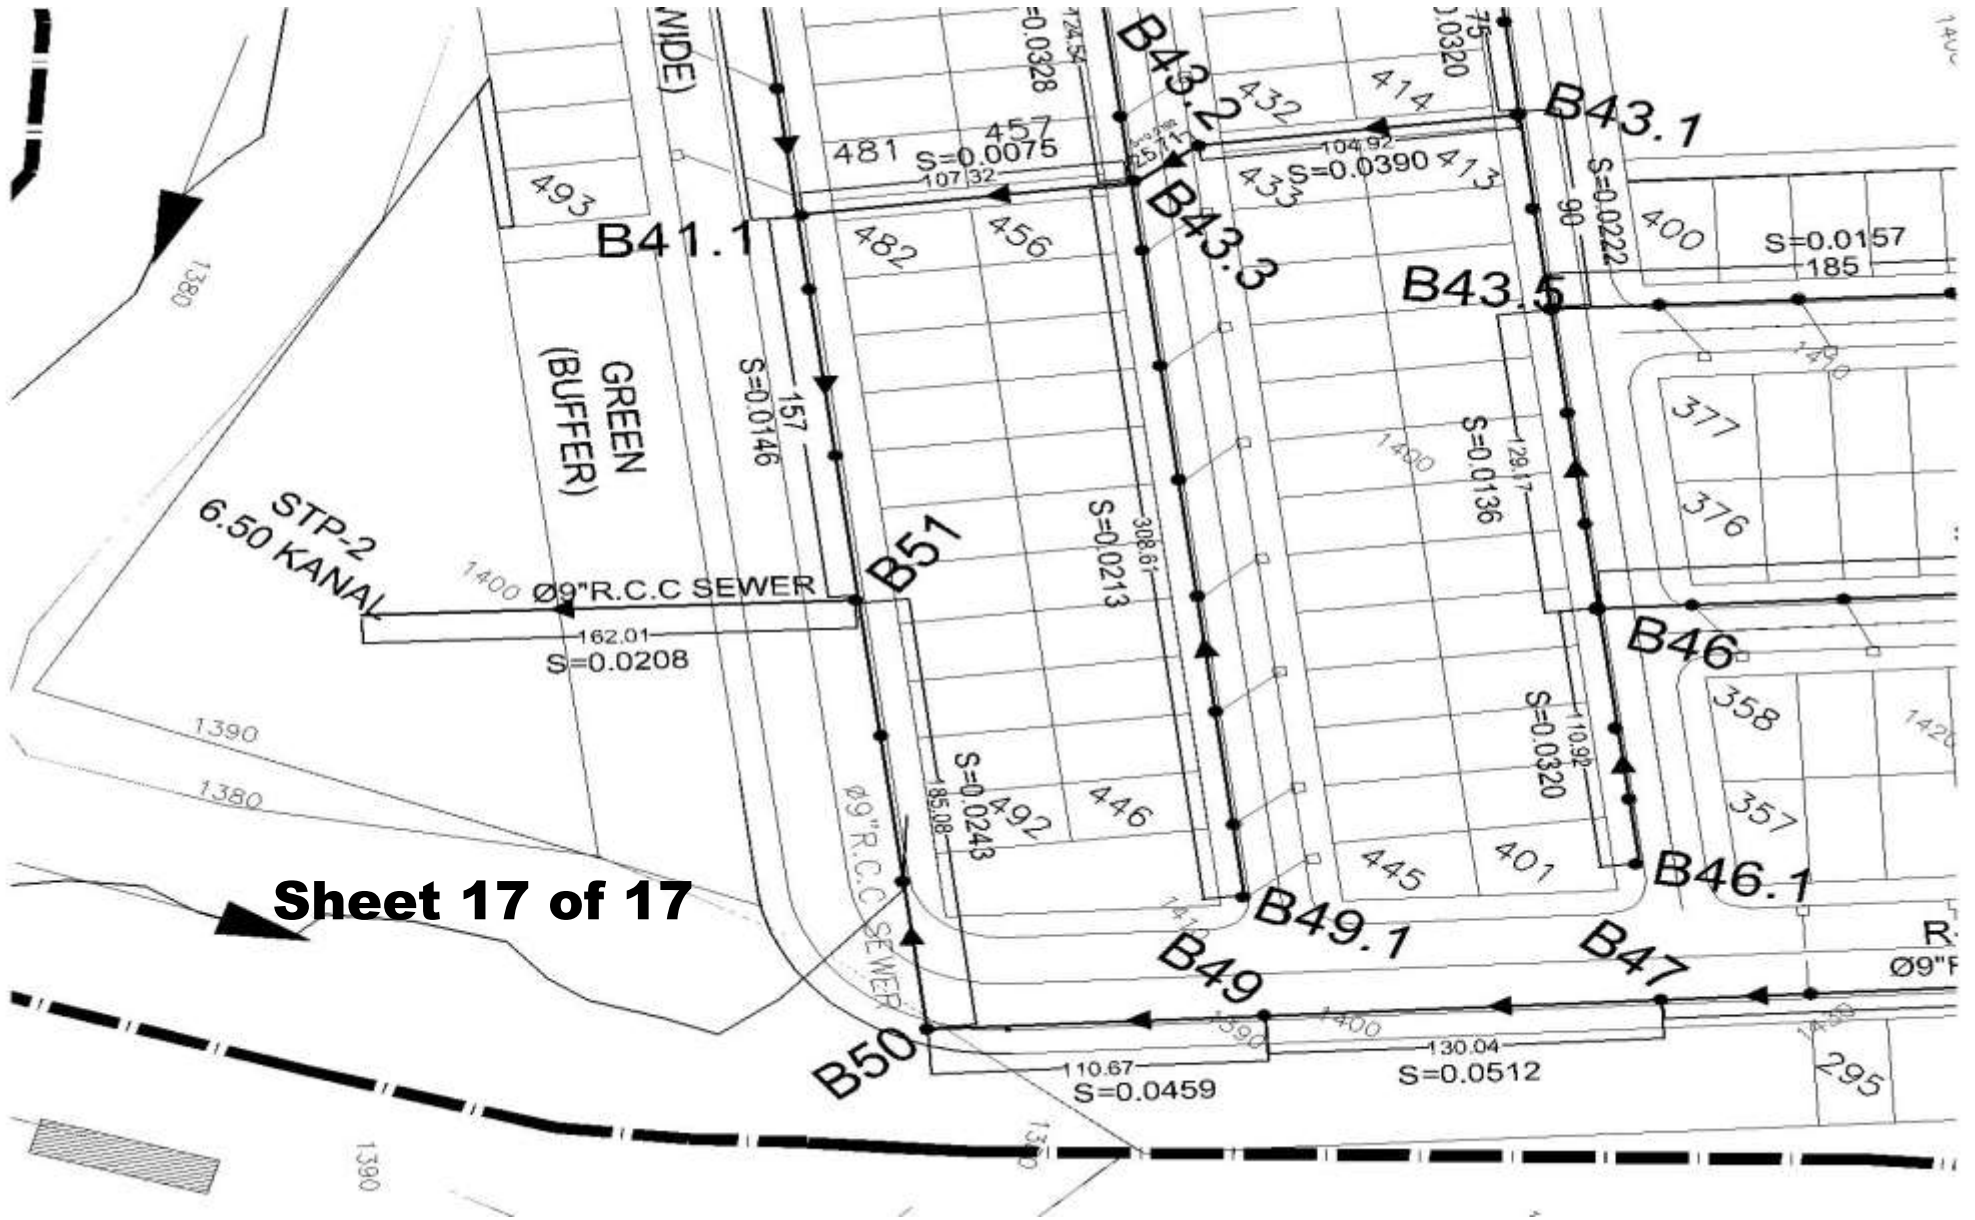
Sewer layout plan of Zone-2 at R/S of R-14
